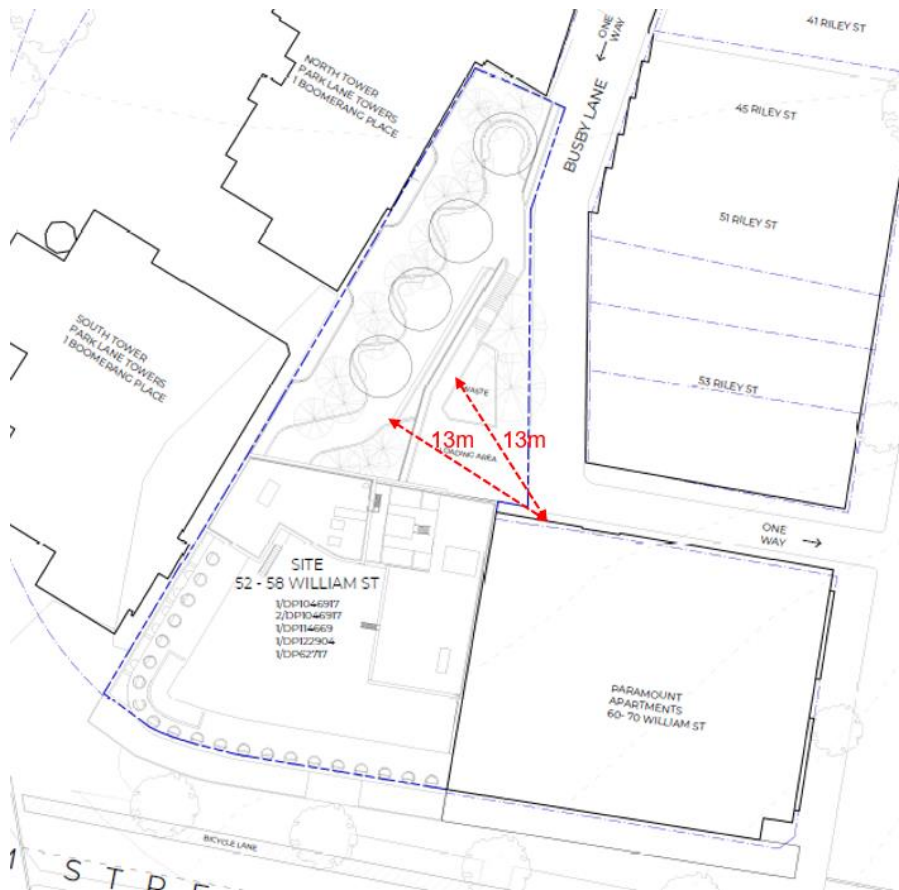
Site plan showing approximate separation distance between the raised terrace and the balconies at 60-70 William Street (Paramount Apartments).
